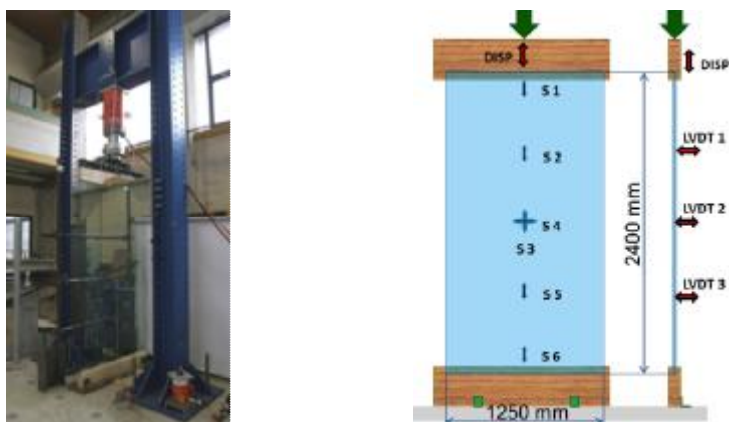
Vertical load test of laminated glass sheet and scheme of instrumentation
